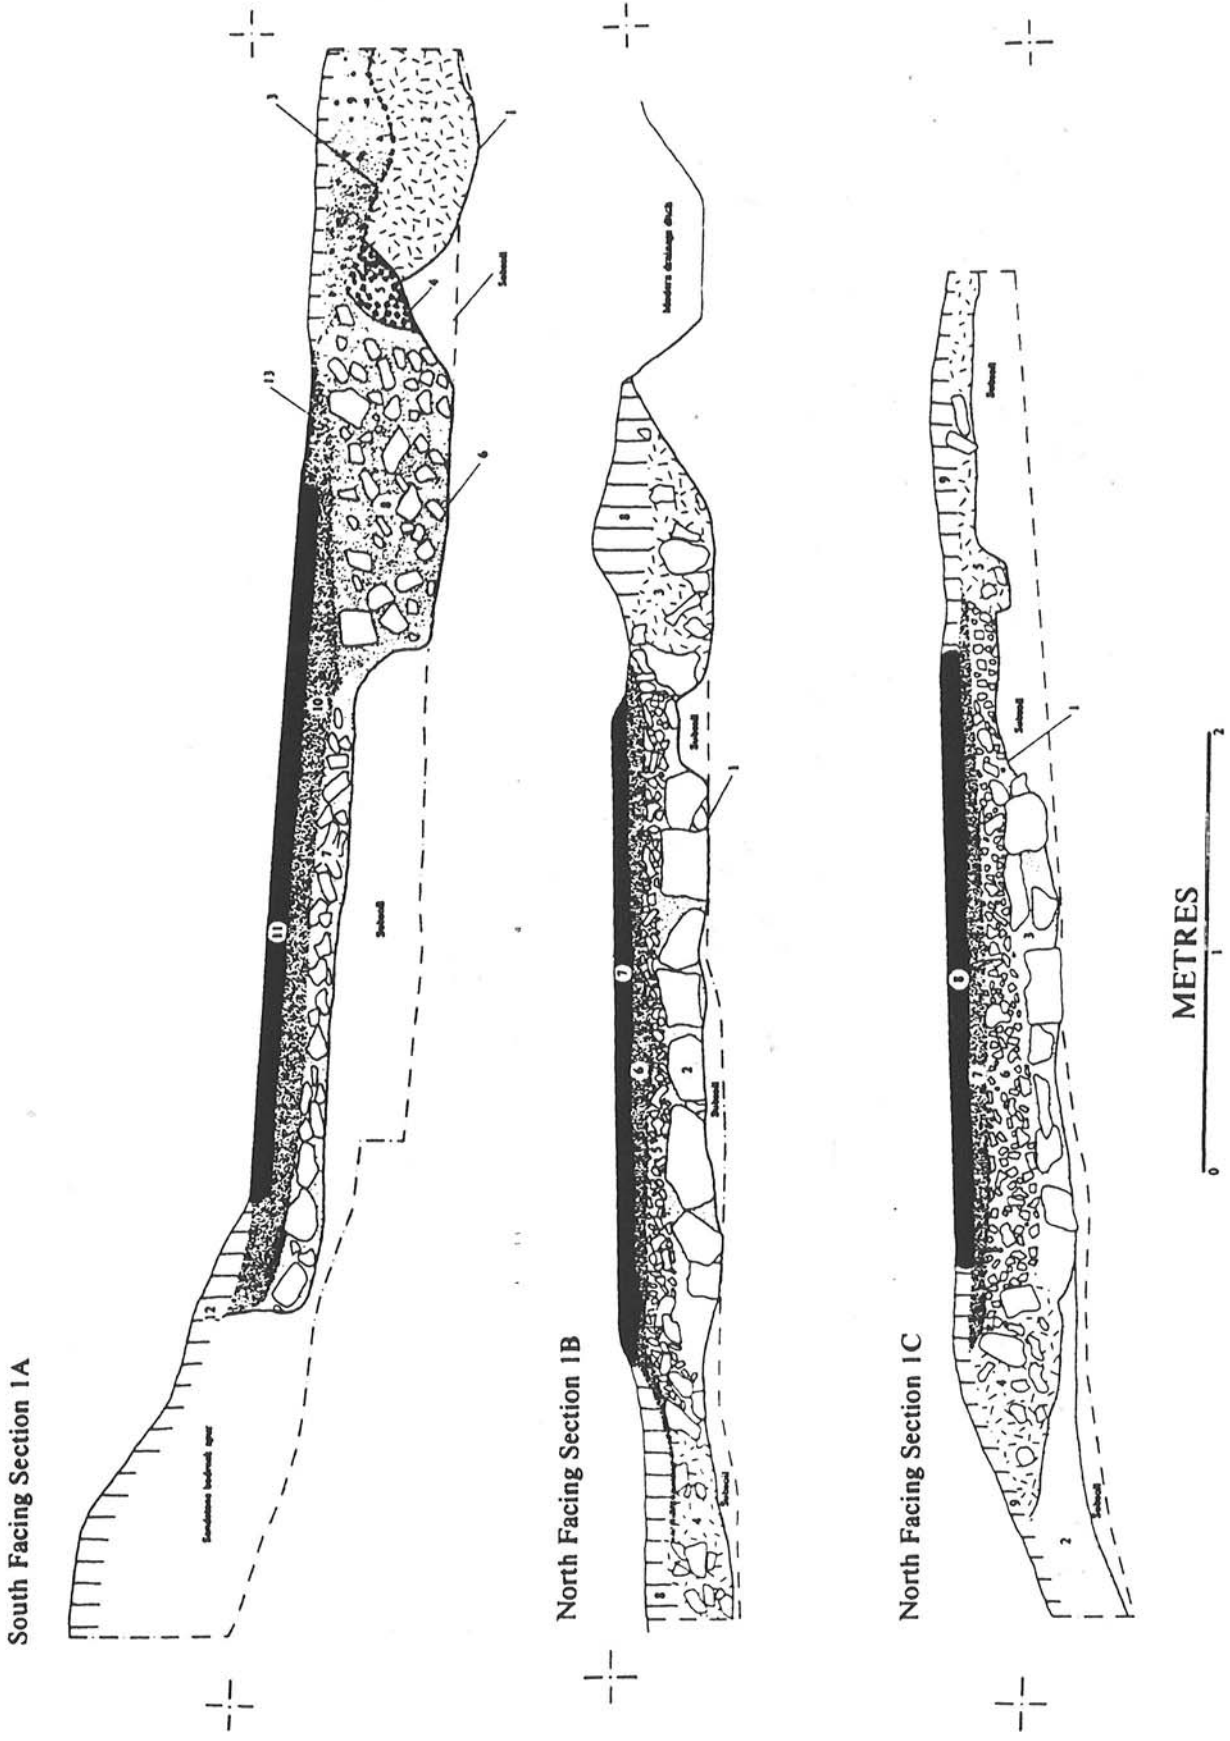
Dere Street - Trenches 1A, 1B and 1C. Sections, showing construction of modern road and earlier ditch [1] in trench 1A.
